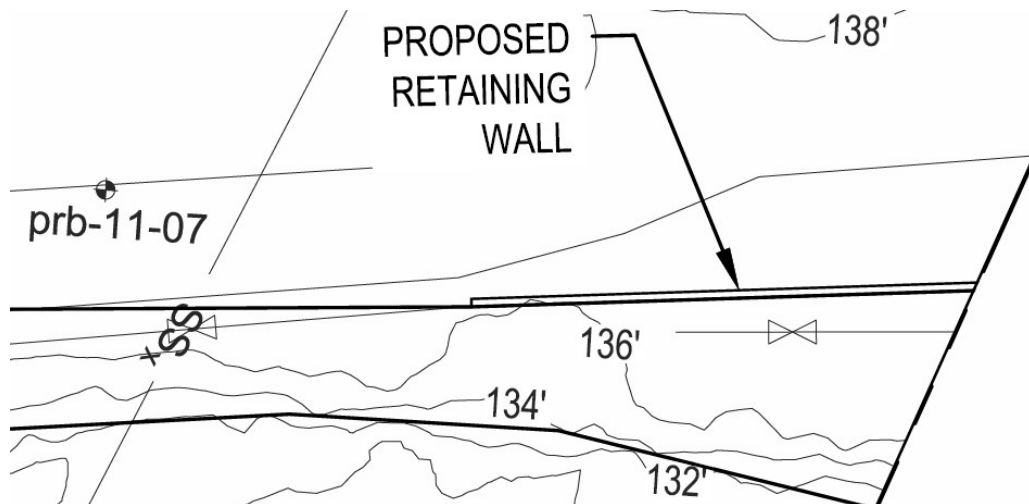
Excerpt from C-103 showing Floodwall (EL+145) and surrounding existing grades.
